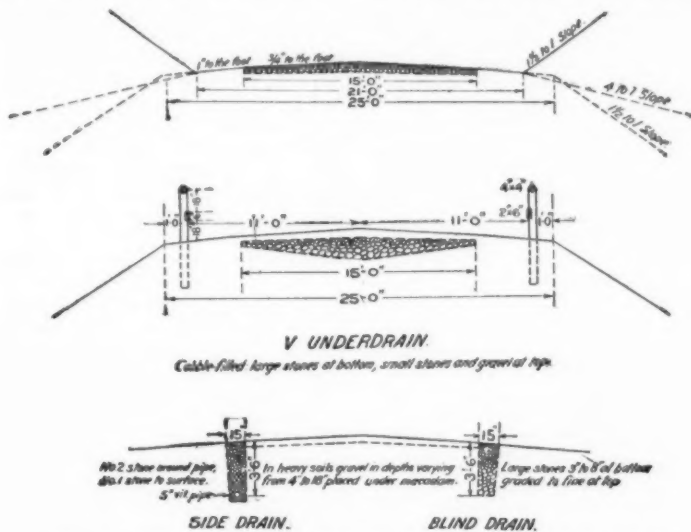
TYPICAL CROSS SECTIONS OF MACADAM ROADS.
